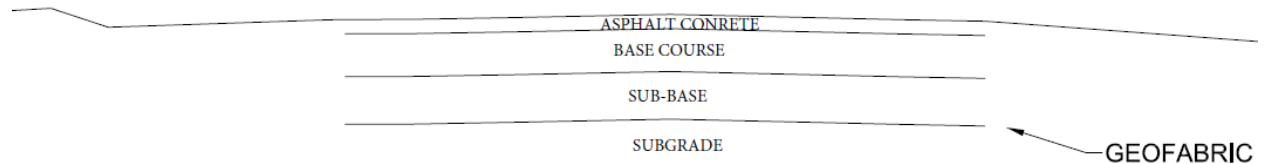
The as-built cross section of the test section FWD4-2. Horizontal scale is equal to vertical scale.
